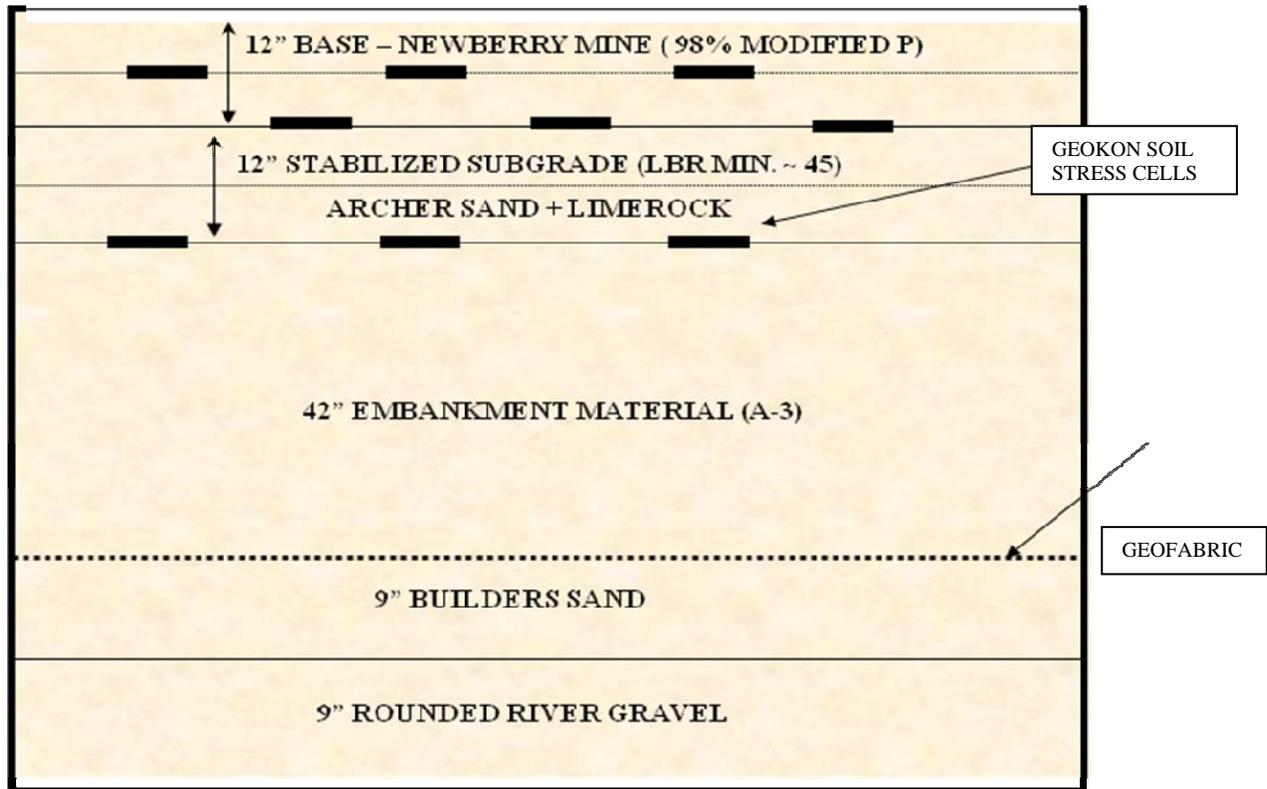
Test Pit Cross-section – Preliminary Trial Run Setup
